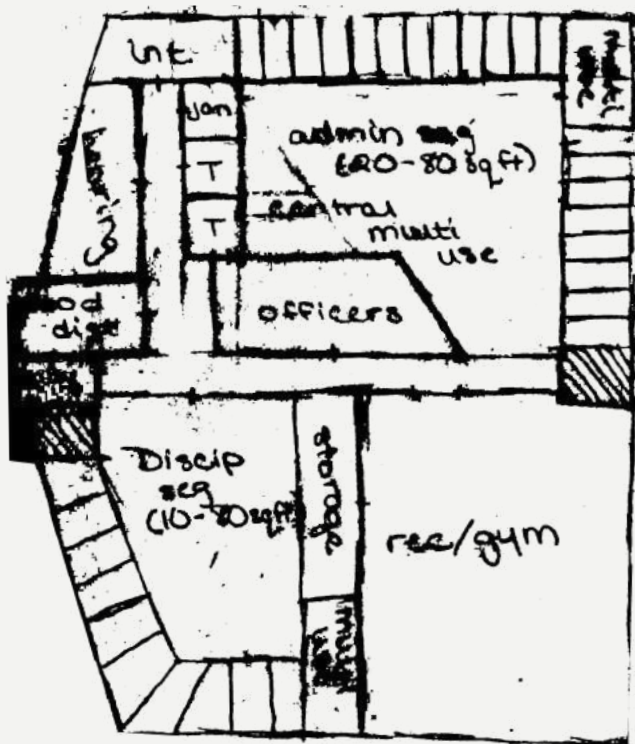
Segregated Housing Cell Layout Exploration Sketches
